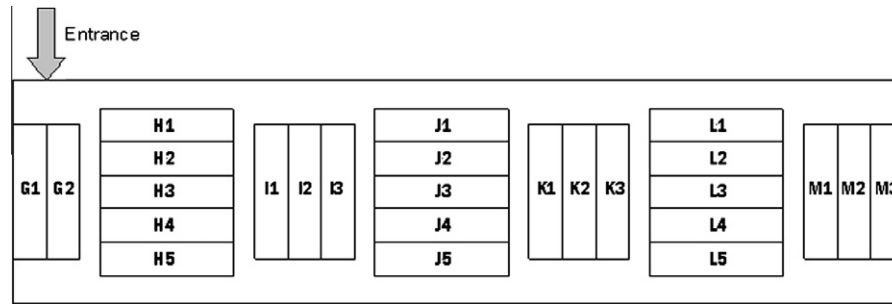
Schema of the wall and the specimens obtained. FR-SCC incorporating synthetic fibres.
